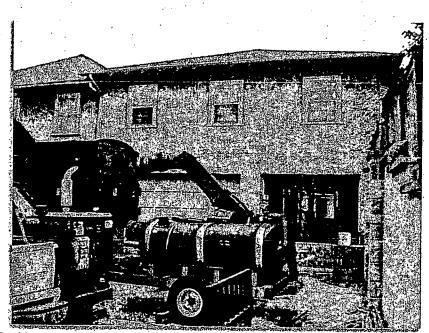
Looking east towards the garage doors. The proposed replacement garage door to the left would be wood panel to match existing with four glass lites. The opening to the right would have a three (3) foot full glass door with two (2) windows (see elevation) within the existing stucco opening.
